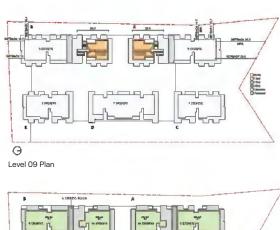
Indicative Floor Plans (Source: Antoniades Architects).
